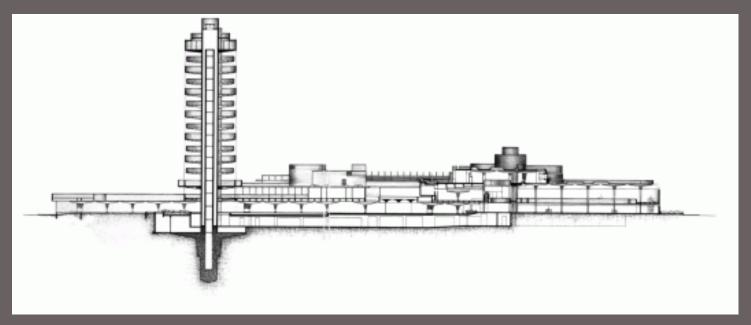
Research Tower, 1946. South, and the Administration Building, to the left, (1) supply; (2) elevator; (3) stairs; (4) toilet; (5) exhaust (FLWA, drawing no. 4401.066; (c) Frank Lloyd Wright Foundation; graphic additions by author)
